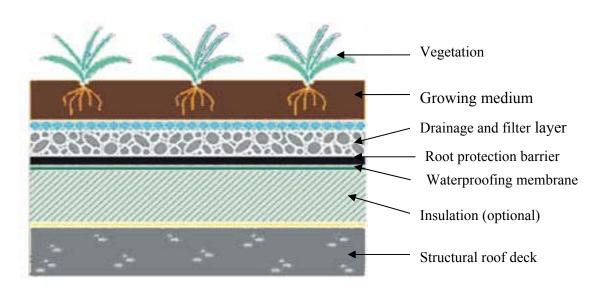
Cross section of a typical green roof (image from greenroofs.com)
